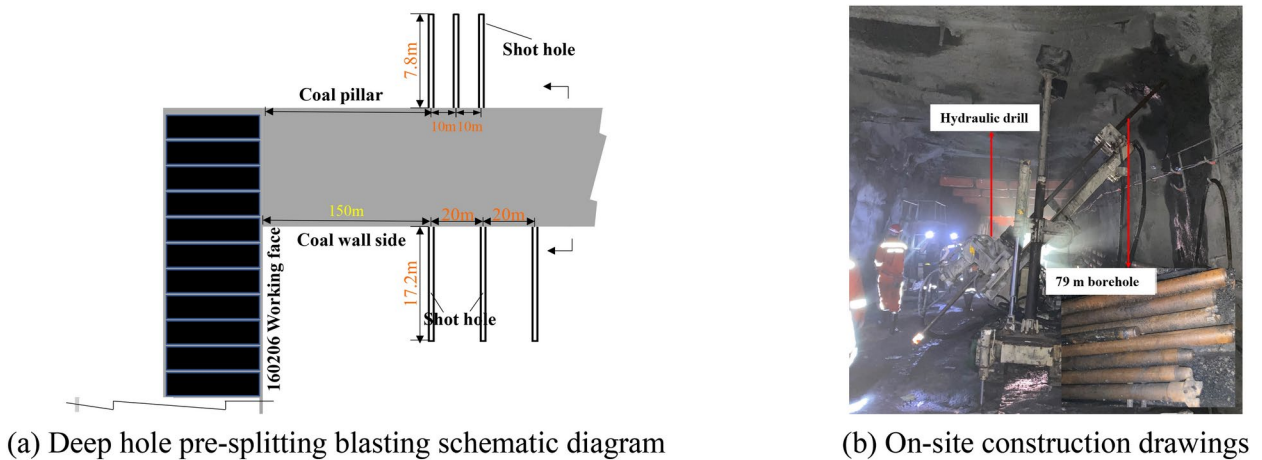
Deep hole pre-splitting blasting pressure relief hole layout.
